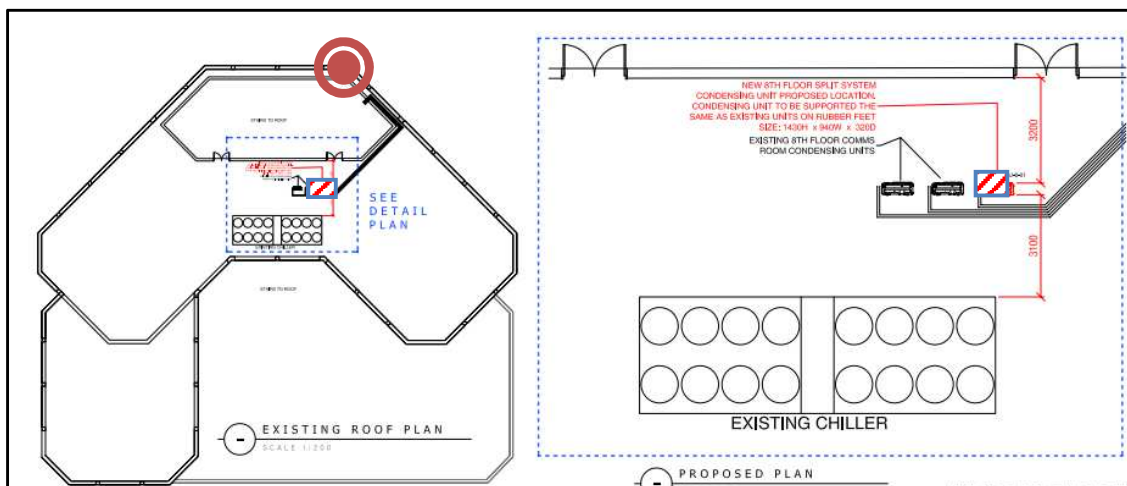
Site measurement position and proposed roof plant installation (Drawing Source: CityServe Mechanical)
